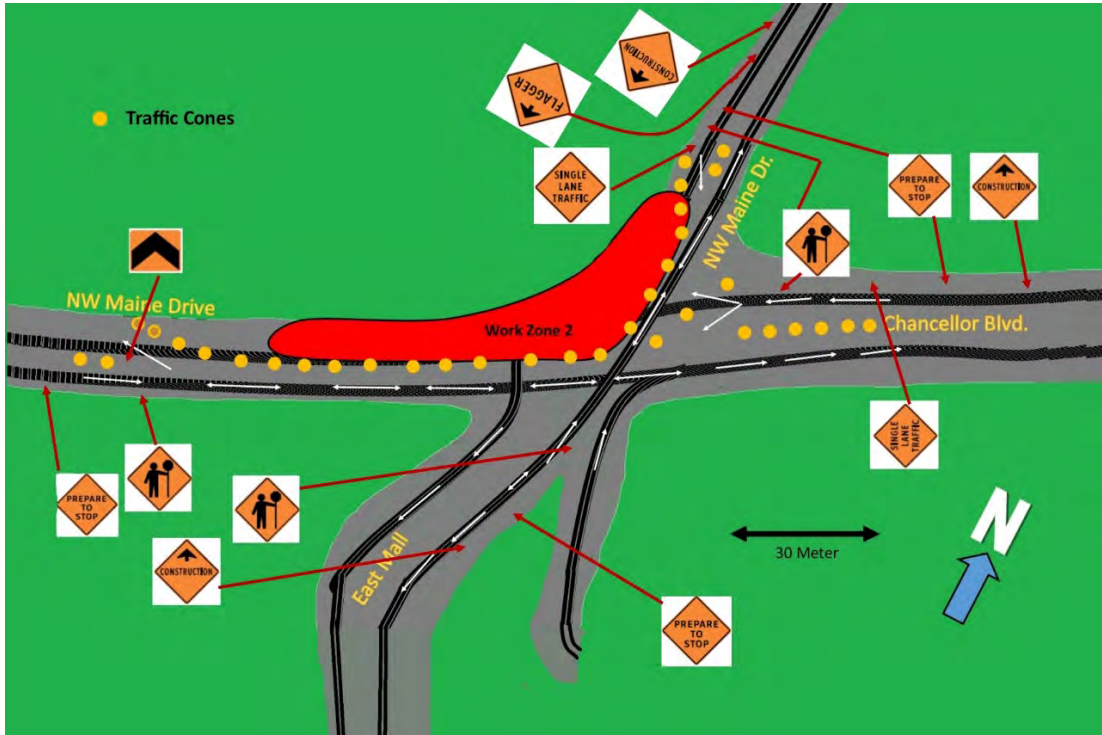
TMP for Work Being Performed on NW Corner of Intersection
